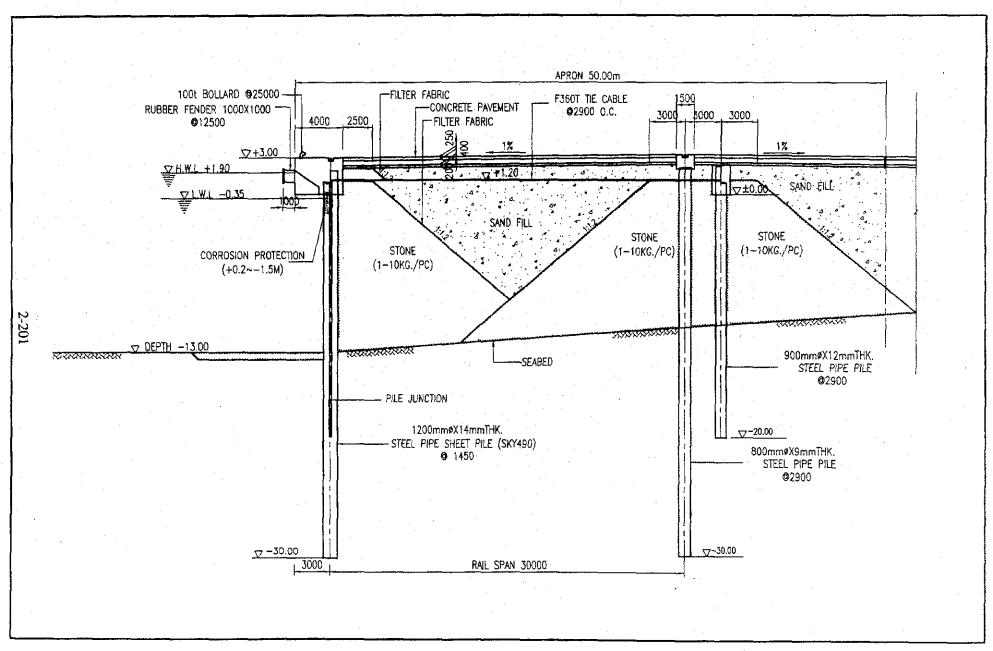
Steel Pipe Sheet Pile Type Quaywall for Container Berth
